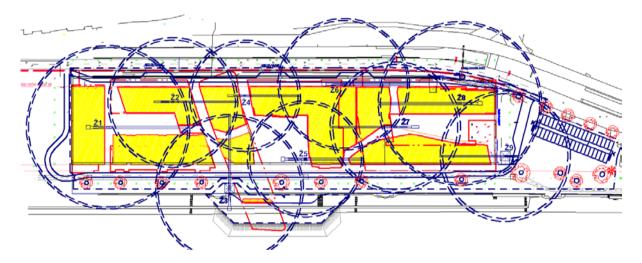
Tower Cranes Plan – Multifunctional Complex RiverPark Bratislava
